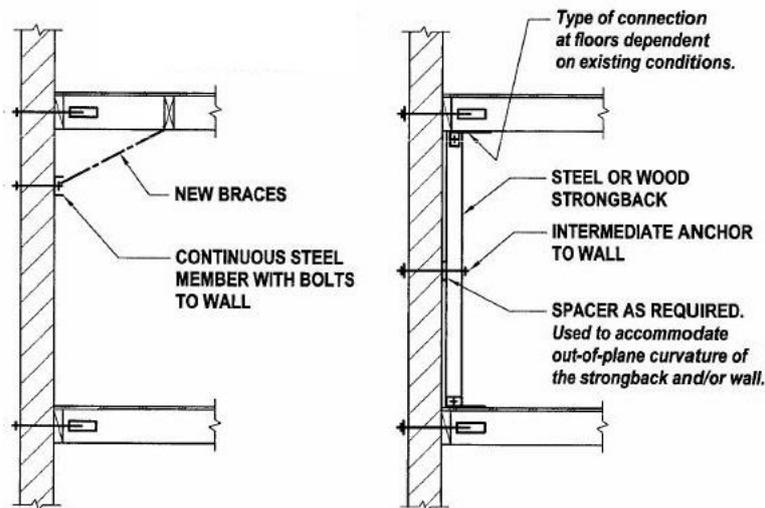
Wall bracing: diagonal (left) and vertical (right) [26].
